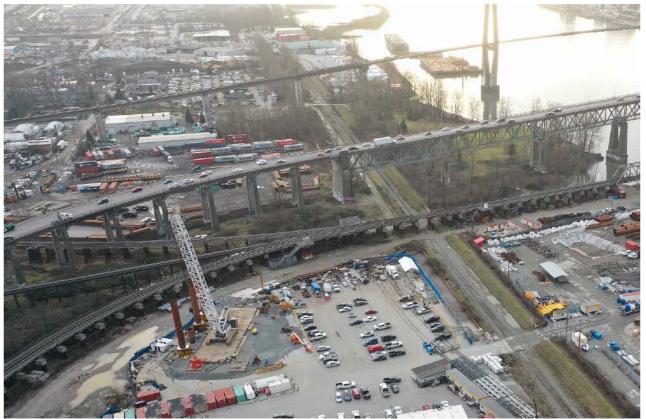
PILE INSTALLATION AT PIER S5 IN SURREY, B.C.
